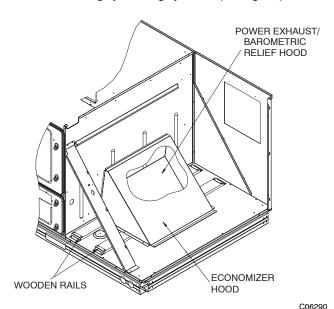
Economizer and Barometric Relief/Power Exhaust Hoods Shipping Positions
